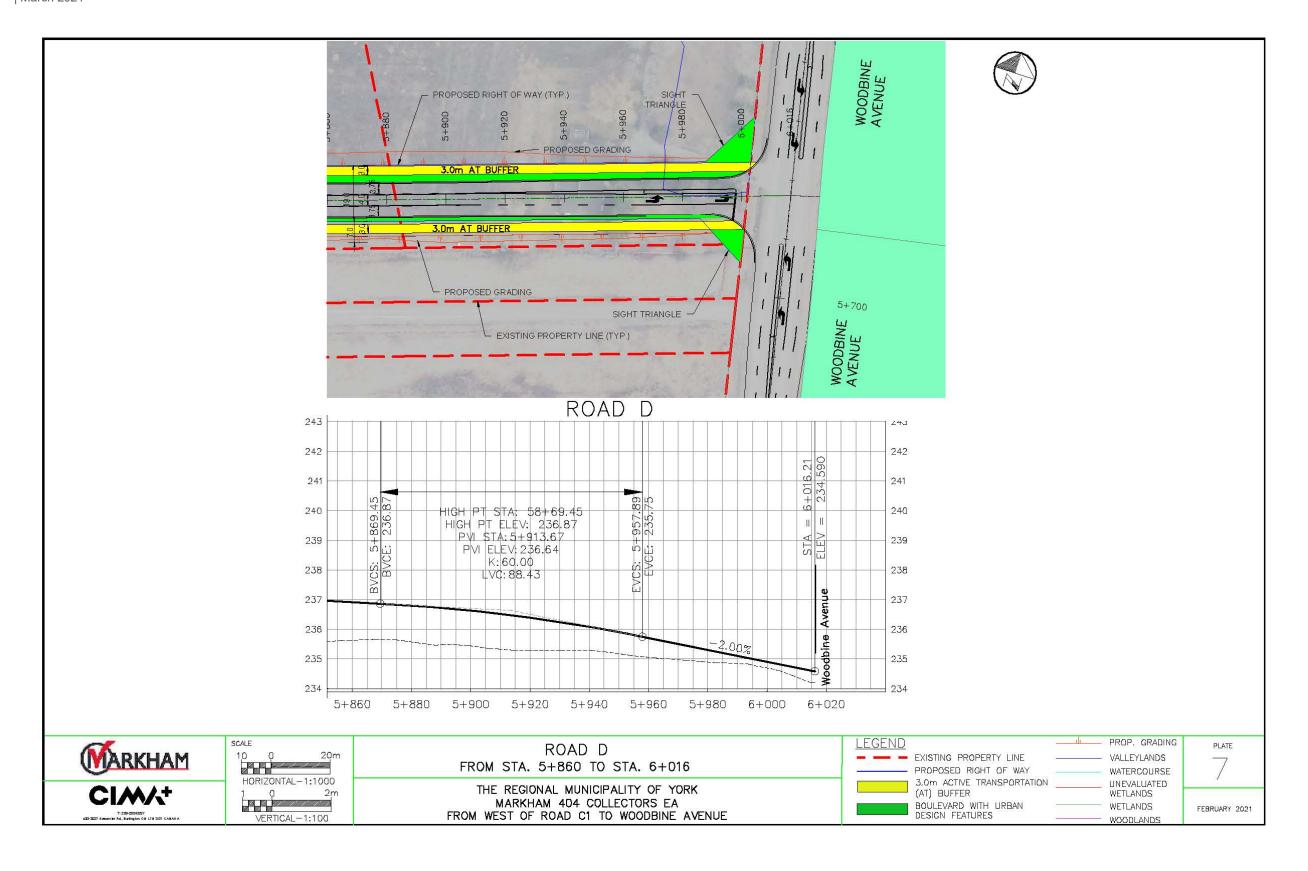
Preliminary Design Plate Road D Station 5+860 to Station 6+016
